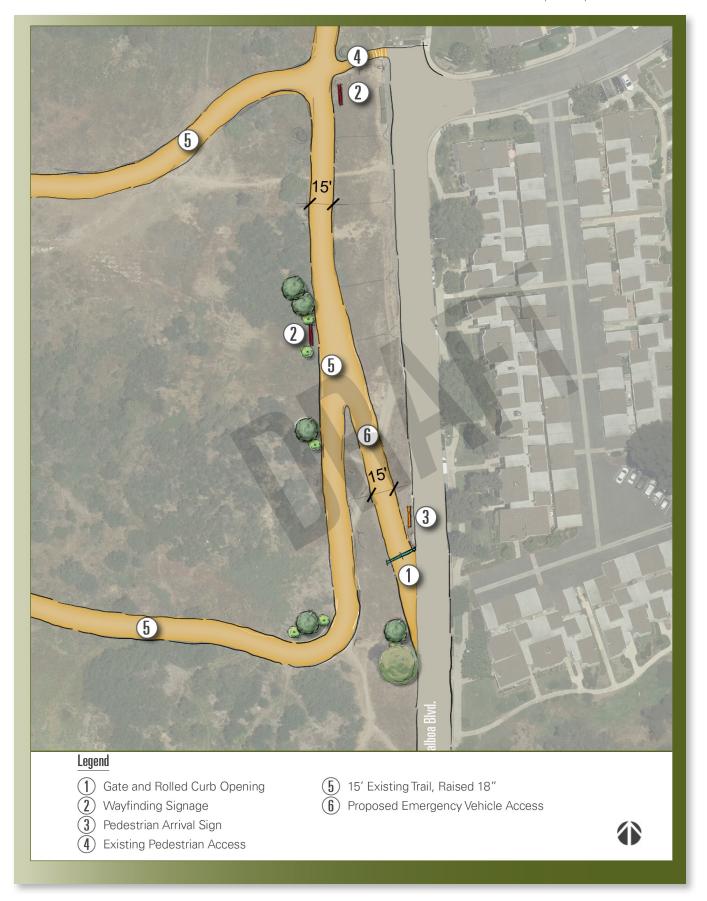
Balboa Boulevard Entrance Plan
